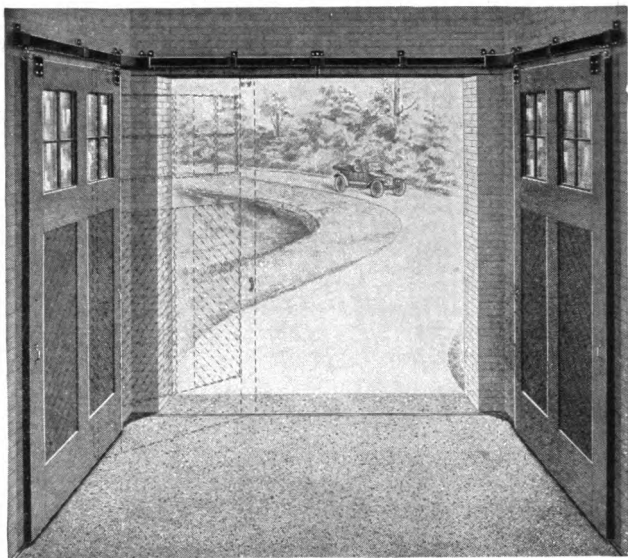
Plan and Elevation Showing Use of Curved Corner Bracket
